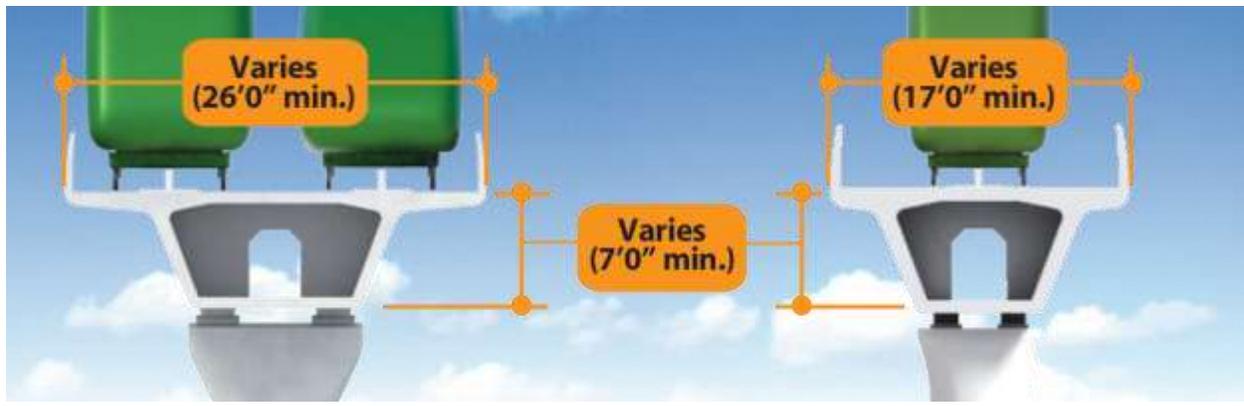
Left: Typical dual-track box girder. Right: Typical single-track box girder.
